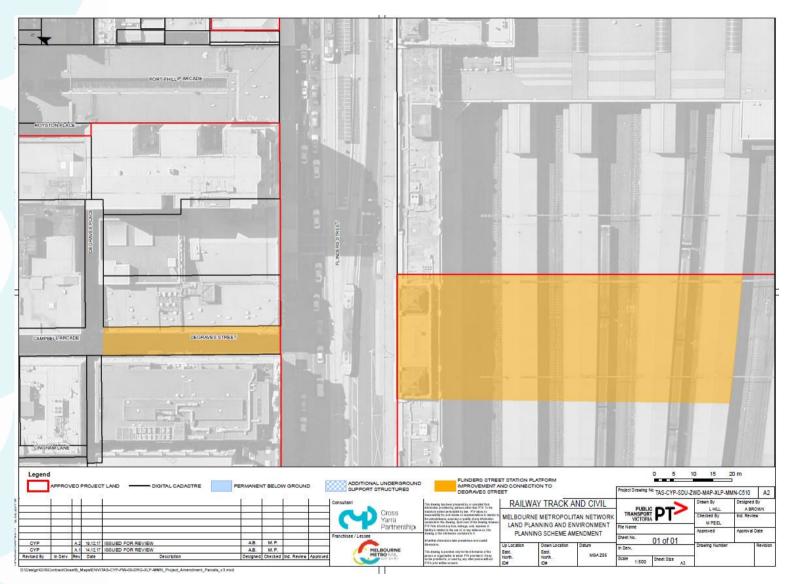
ADDITIONAL PROJECT LAND REQUIRED AT CAMPBELL ARCADE FOR FLINDERS STREET STATION CONNECTION AND FLINDERS STREET STATION MID-PLATFORM CONNECTION
